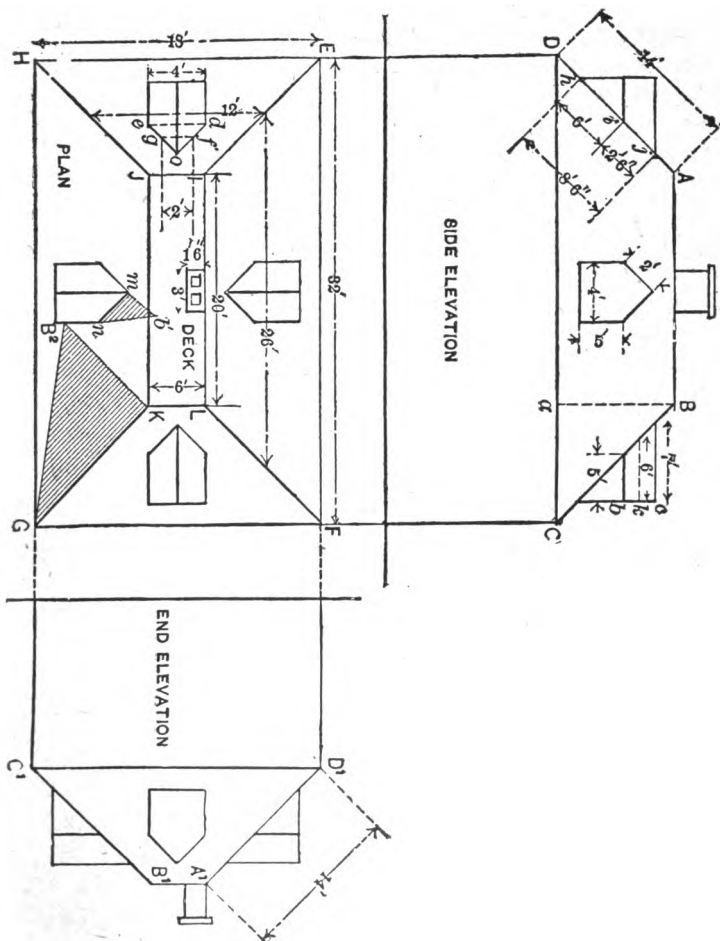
Plan and Elevations of Mansard Roof with Deck and Dormers
